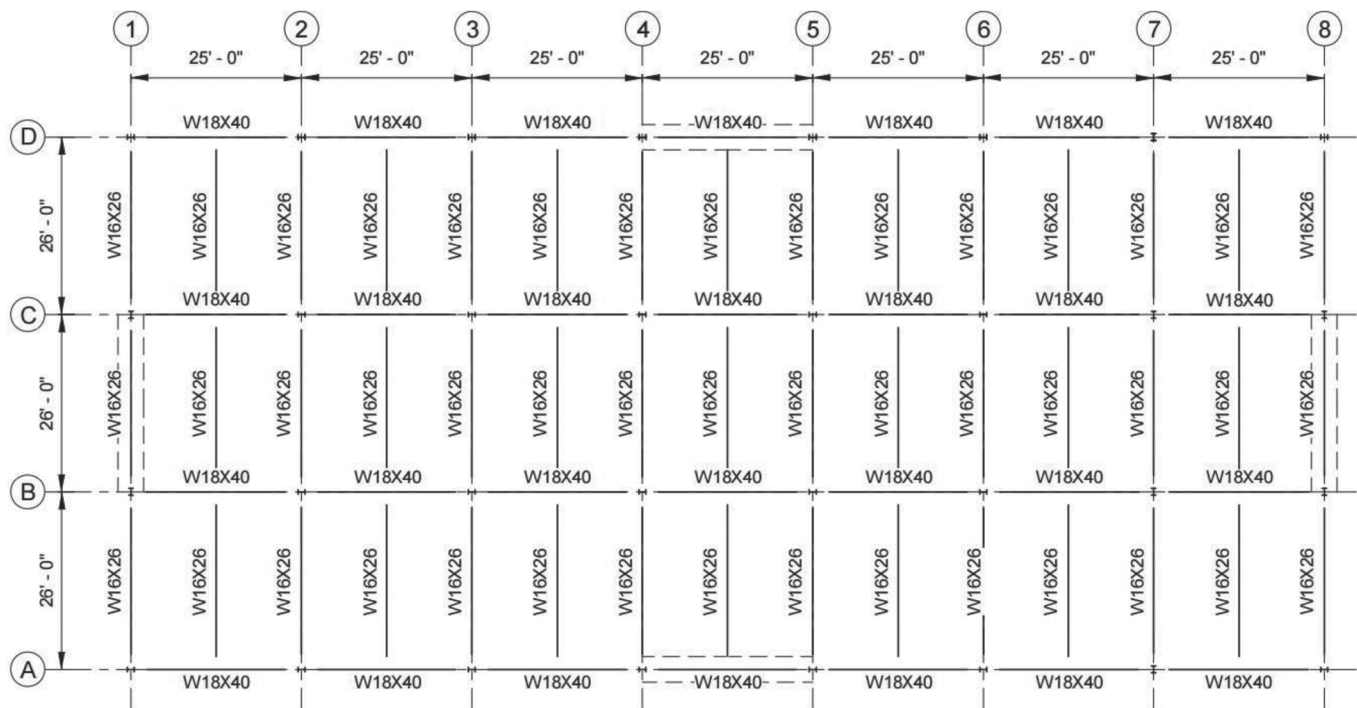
Plan view (level 2) of building B (dotted lines indicate braced frames).
